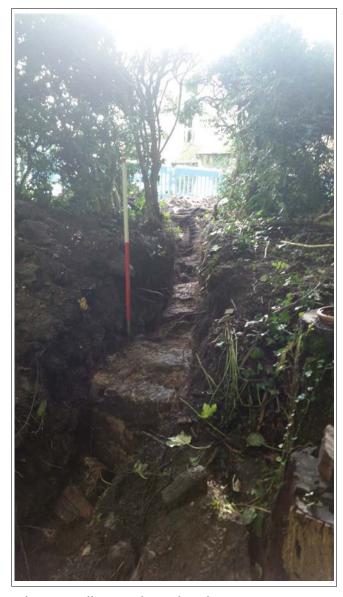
Wall 03, with Brick Culvert 04 behind. Looking Southeast. Scale 1x1m
